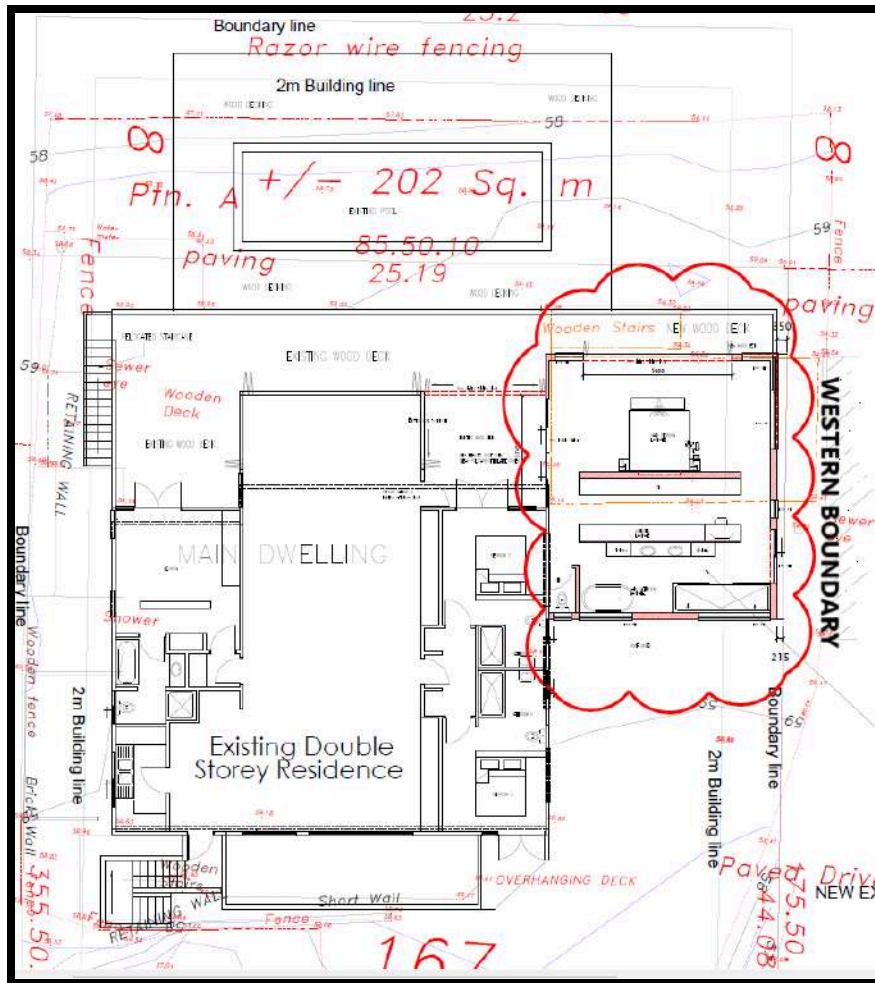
FIRST FLOOR PLAN AND PROPOSED EXTENSION
